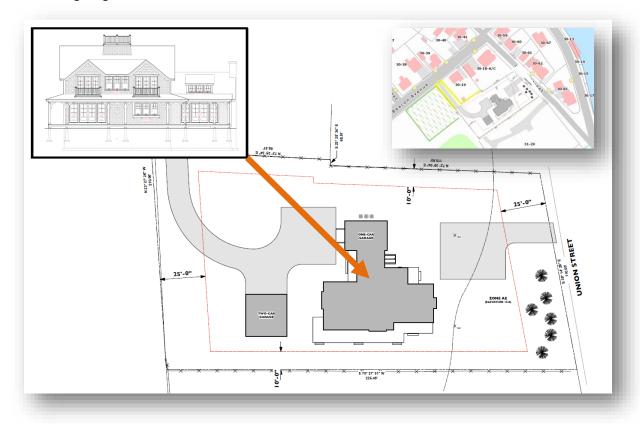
As-of-Right, Large Single Family House Development Plan (the "Anderson Plan")
